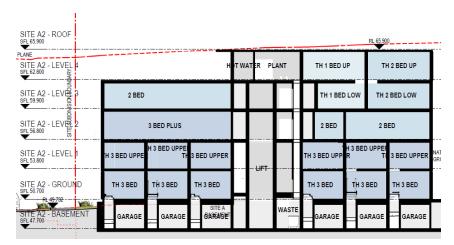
Height breach to Site A (Source: Rothe Lowman plans)
